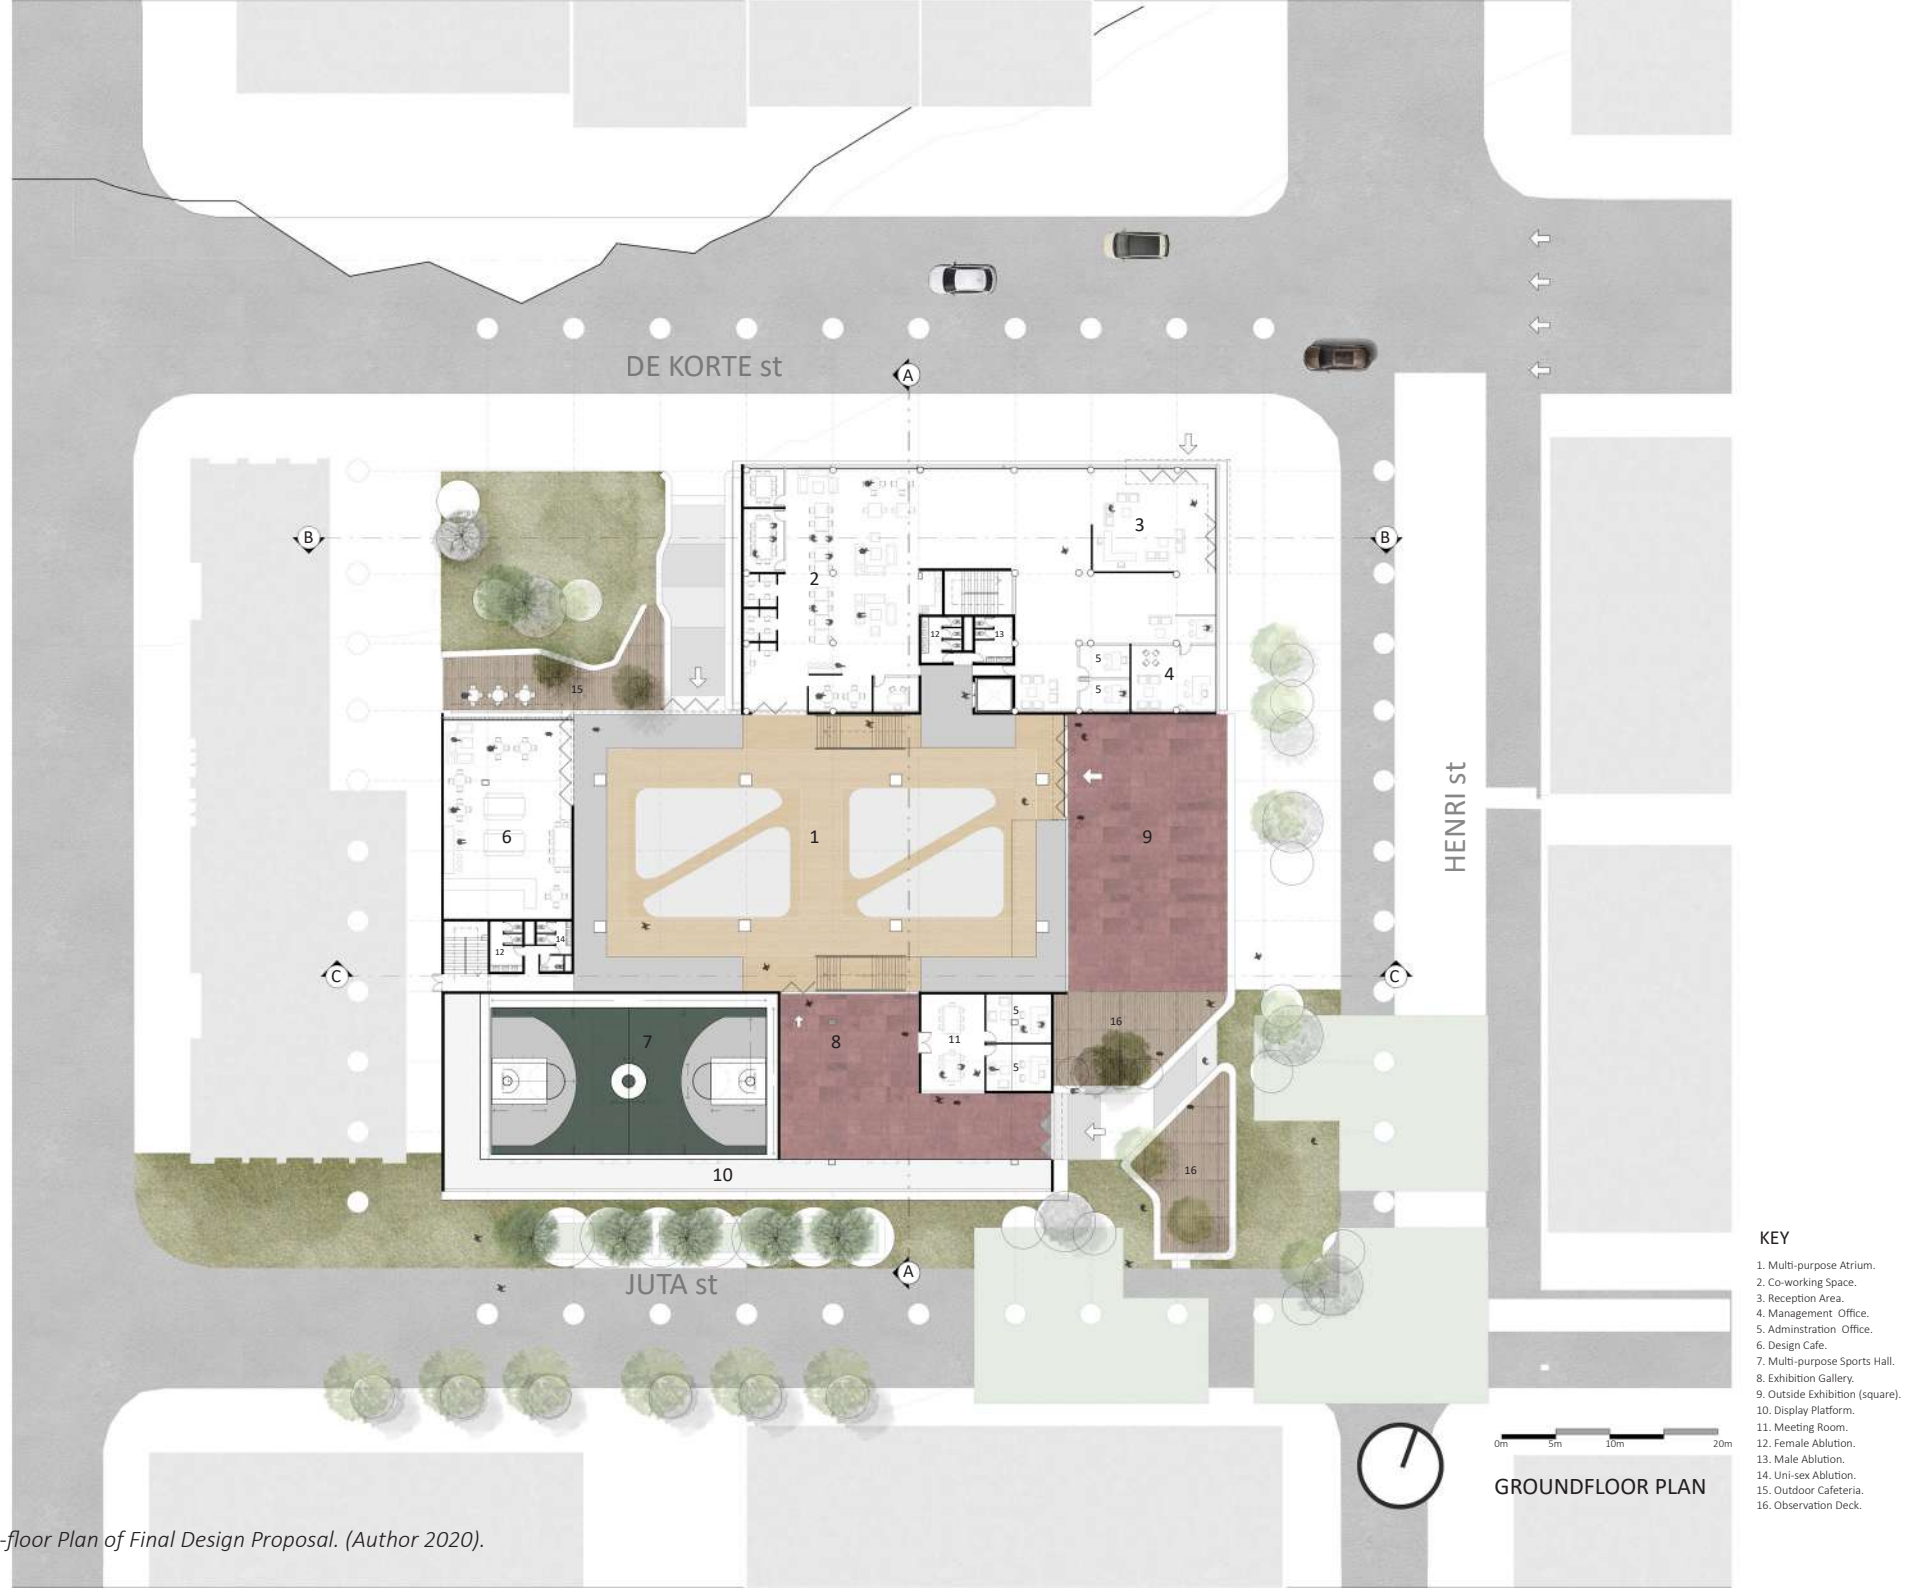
(ii): Ground-floor Plan of Final Design Proposal. (Author 2020).
